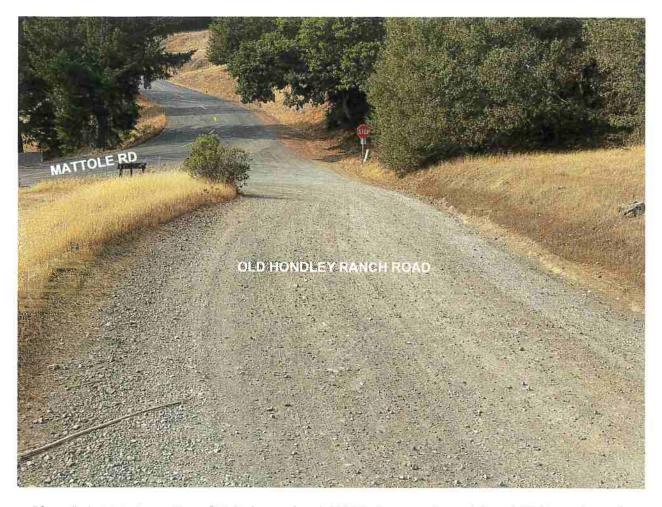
Intersection of Mattole Road and Old Hindley Ranch Road (Road Width = ±20 feet).
